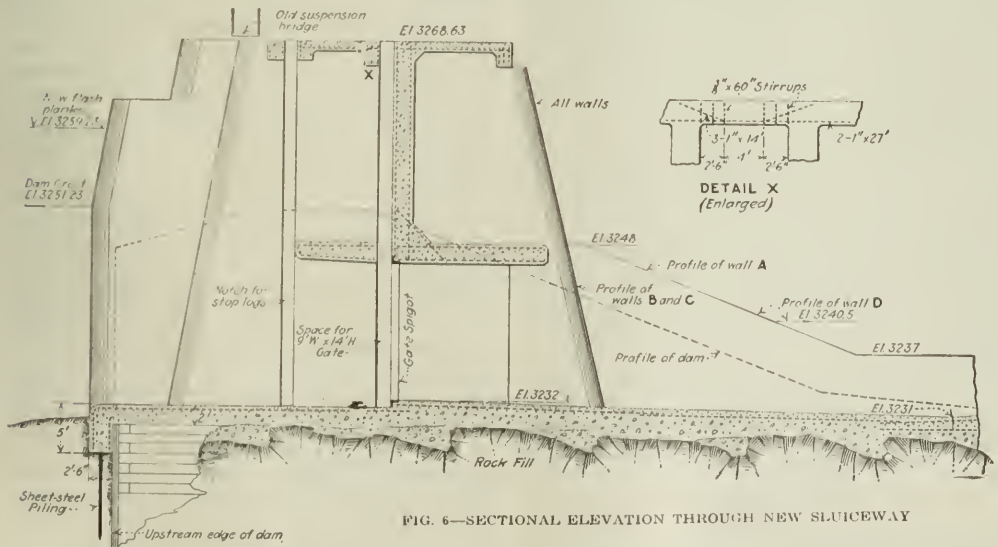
SECTIONAL ELEVATION THROUGH NEW SLUICeway
